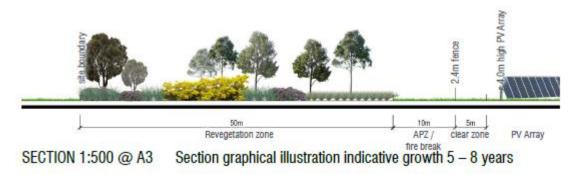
Indicative site boundary to solar infrastructure cross section
